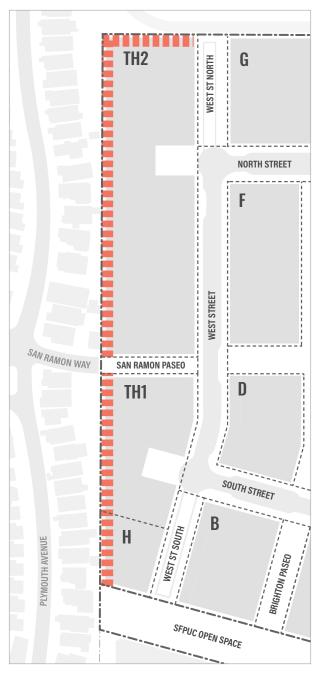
Building Facades at Western and Northern Project Boundaries
